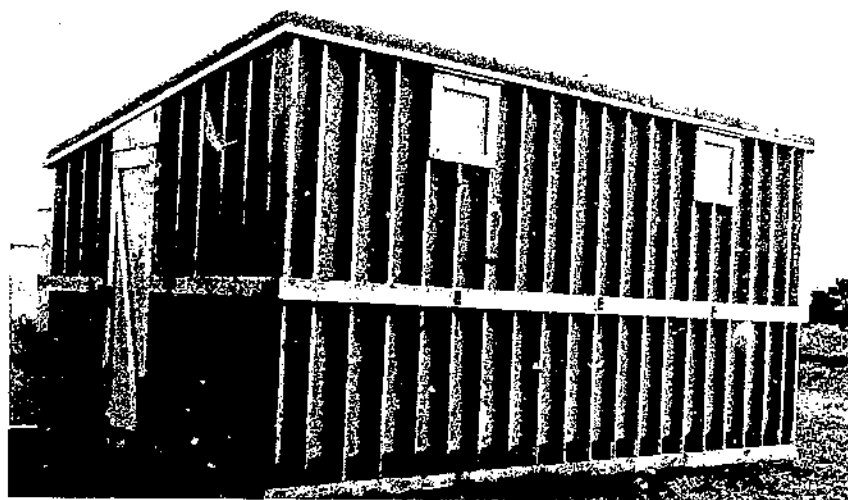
Reeking bin wallboard bin constructed at Jamestown.
